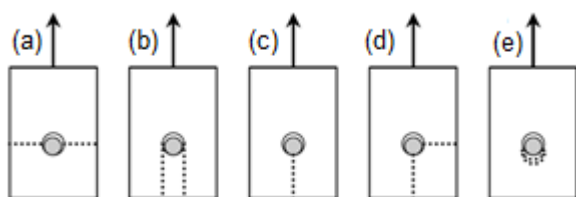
FRP bolted connections failure modes, adapted from [6]. (a) net-tension; (b) shear out; (c) splitting; (d) cleavage; (e) bearing.
